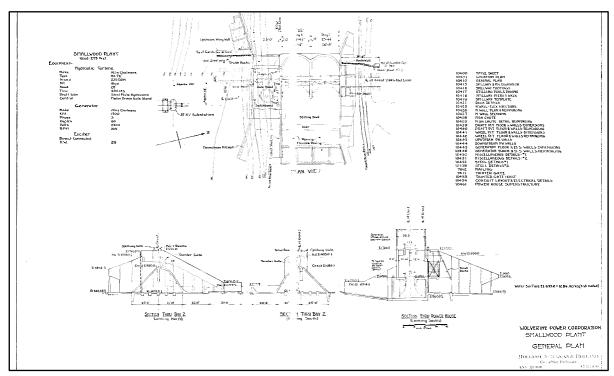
Original Plan Drawings of the Smallwood Dam, March 1924.
